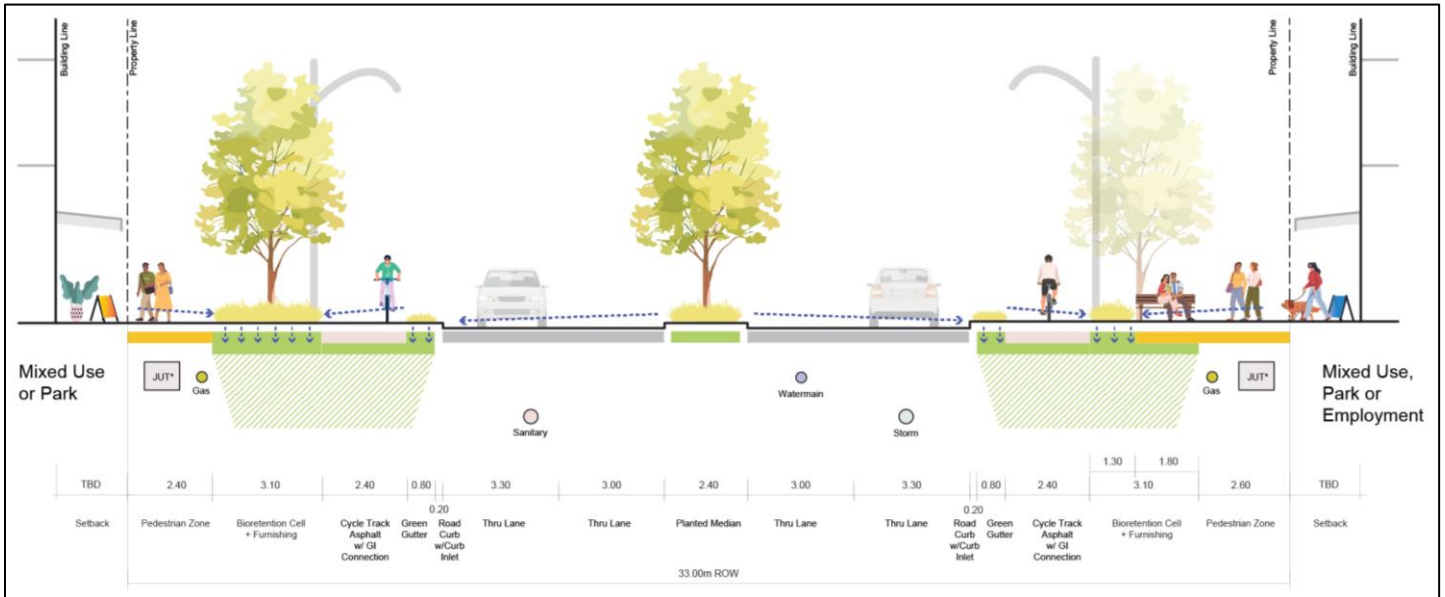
Northern Street (Sheppard Avenue West to Billy Bishop Way) Cross-Section – Option 1
